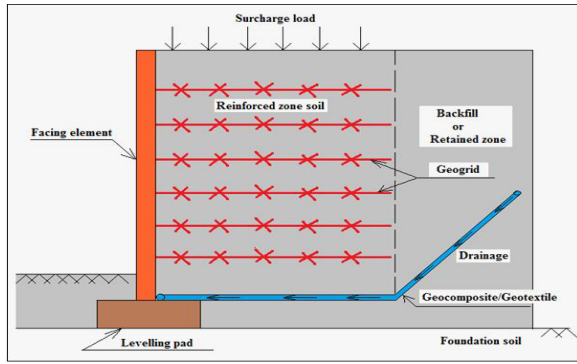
The components of geosynthetic Reinforced Earth wall [3]
